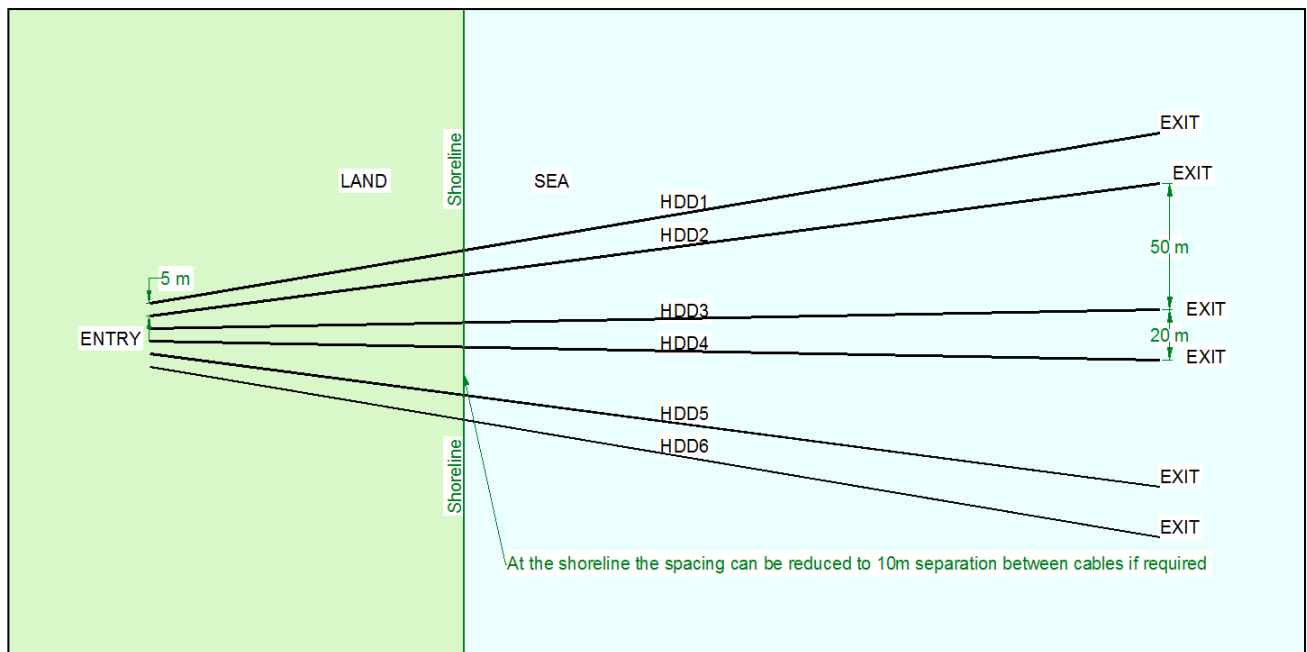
Plan of conceptual fanned arrangement for HDD's with horizontal separation between ducts indicated.
